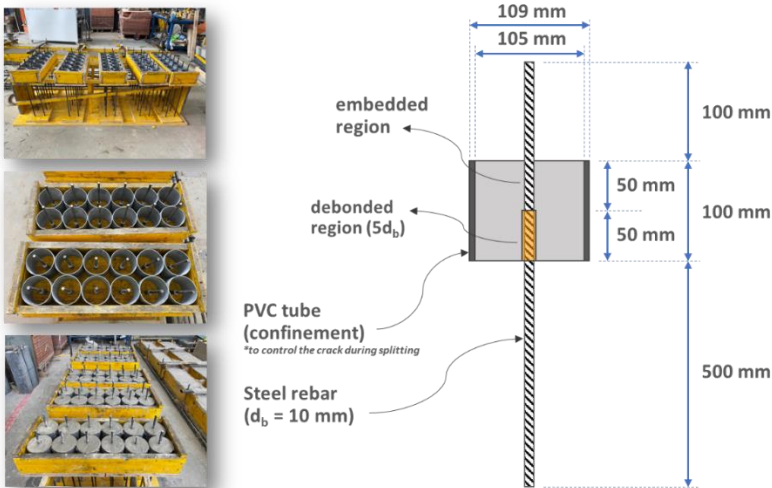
Pull-out mould set (left) and schematic of a pull-out specimen (right)
